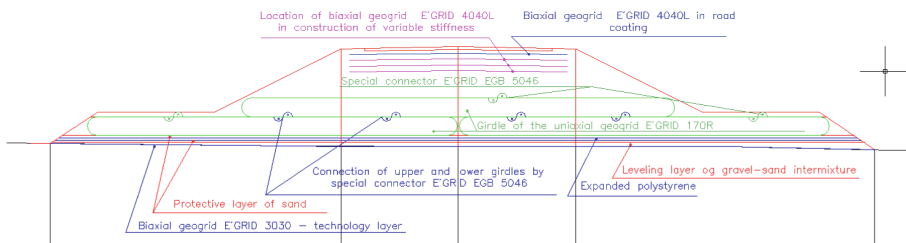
Variable stiffness design outside pipe zone strengthened with geotechnical gird.
